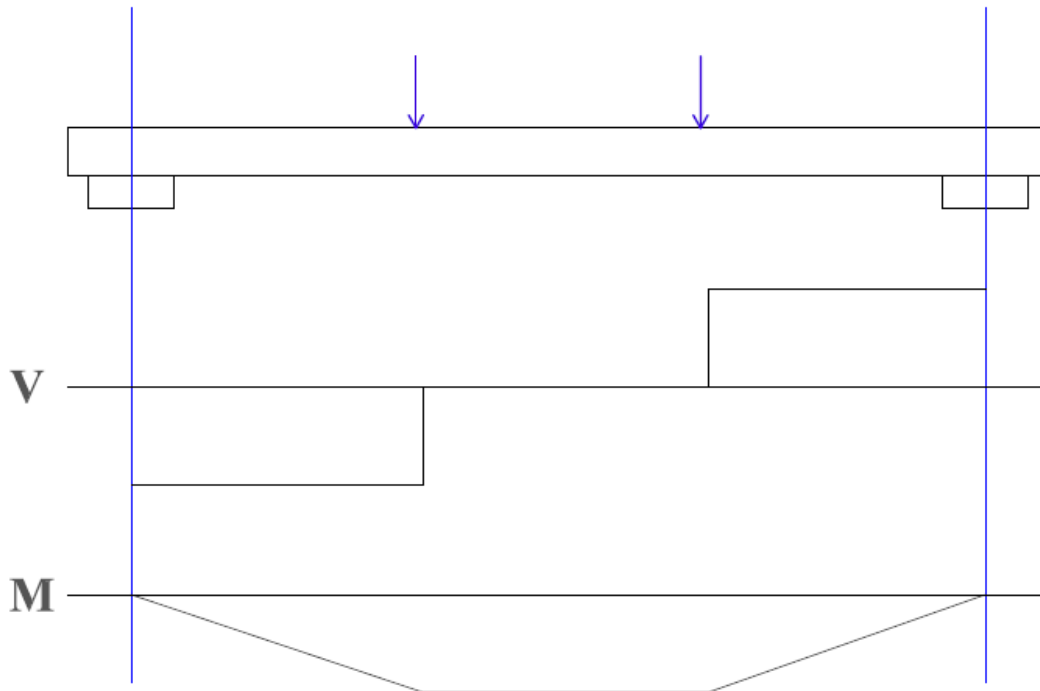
The recommendations of EN 408 (2007) were used to identify the longitudinal MOE. The deck behaved like a beam with two concentrated loads in the span. The deflection was calculated between the two loads.
